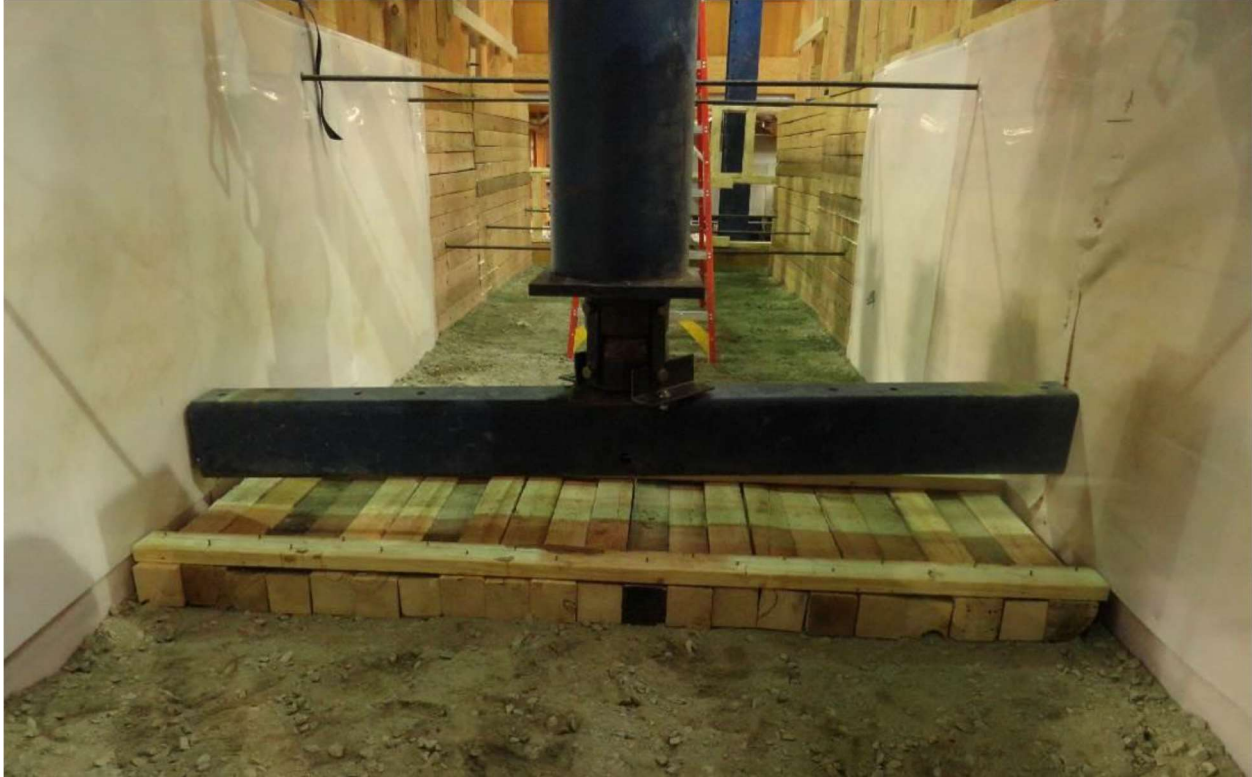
Load Beam before Ultimate Load Test (Walton et al. 2016a)
